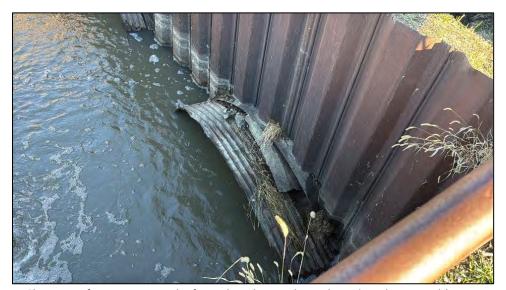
Closeup of upstream end of south culvert. The culvert is submerged by Beaver Lake permanent pool, limiting visibility of the crushed section of 96" corrugated metal pipe.
